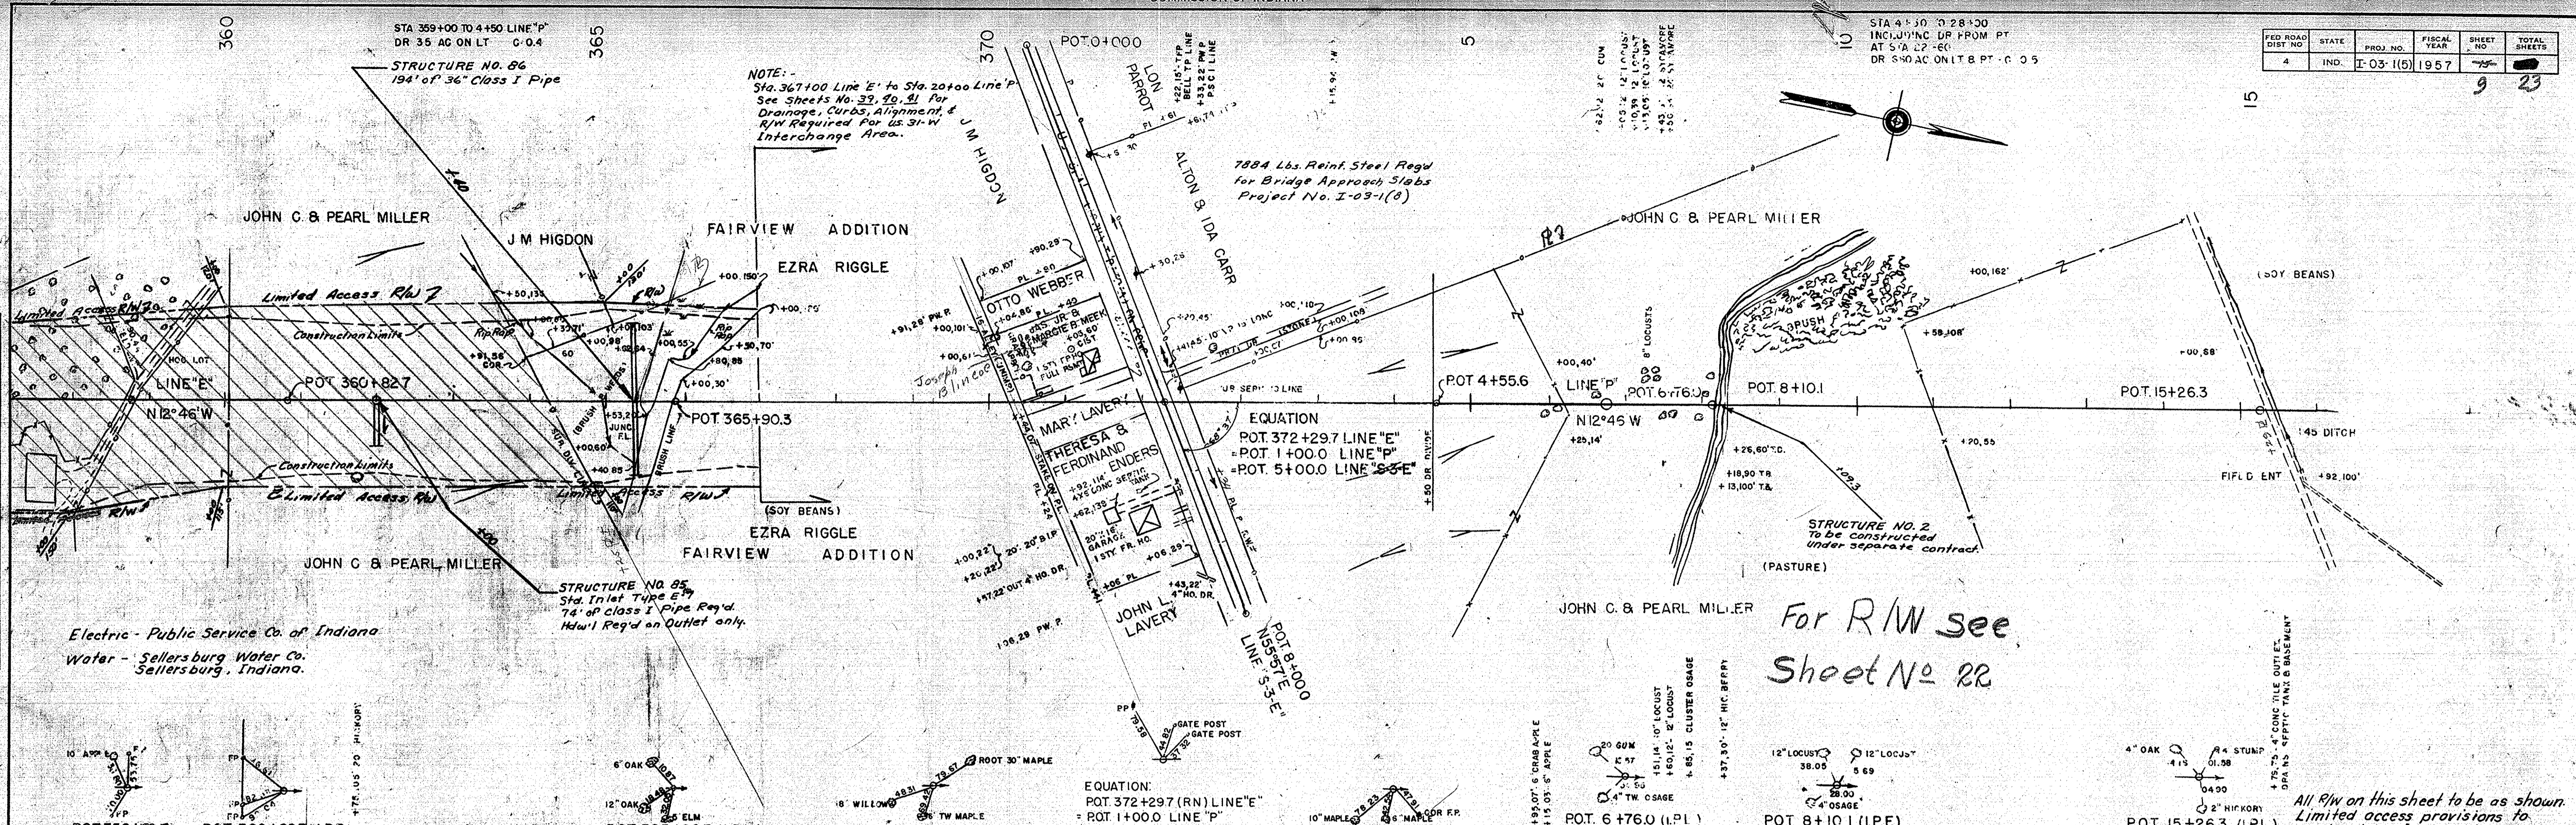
PLAN - PROFILE B. R. R. STANDARD
